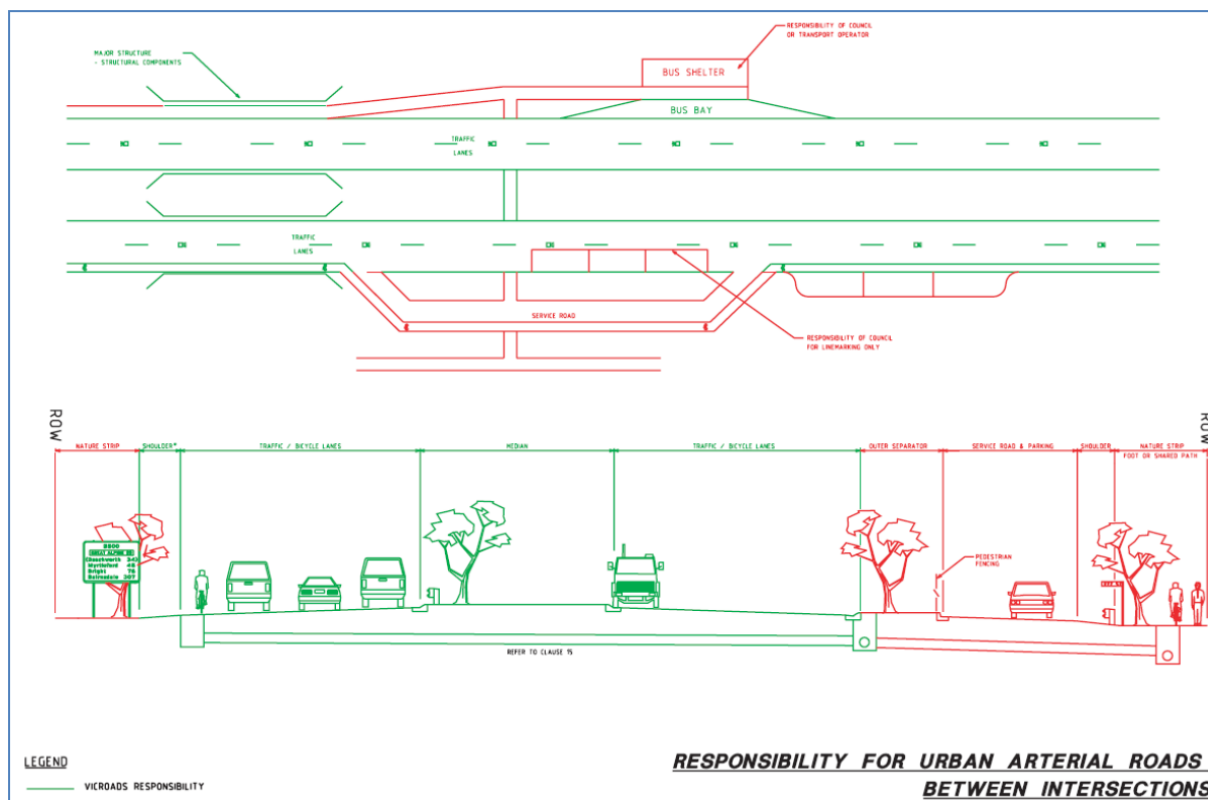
Typical cross section showing Council's area of responsibility outside the kerbs of the VicRoads declared main road
